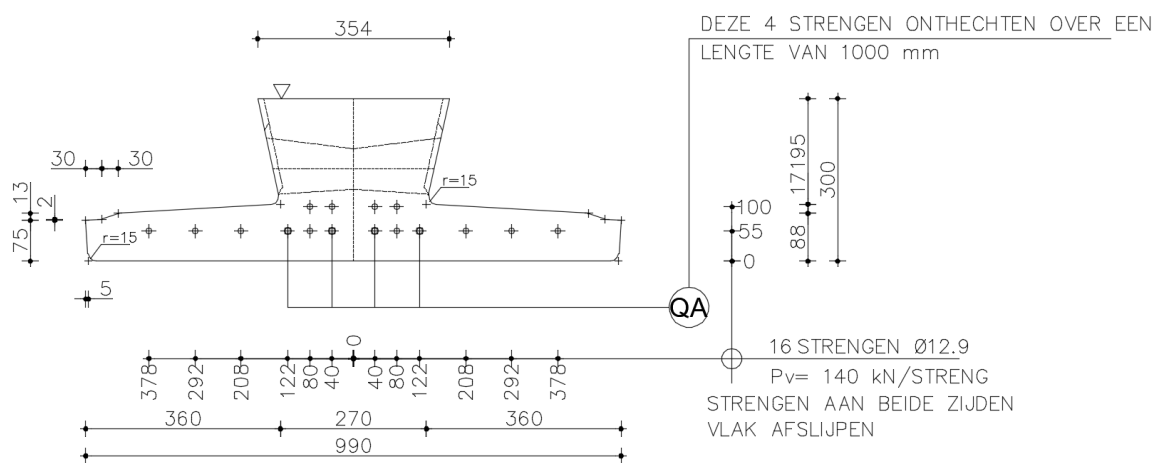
Cross-section dimensions and prestressing layout of prestressed girder
